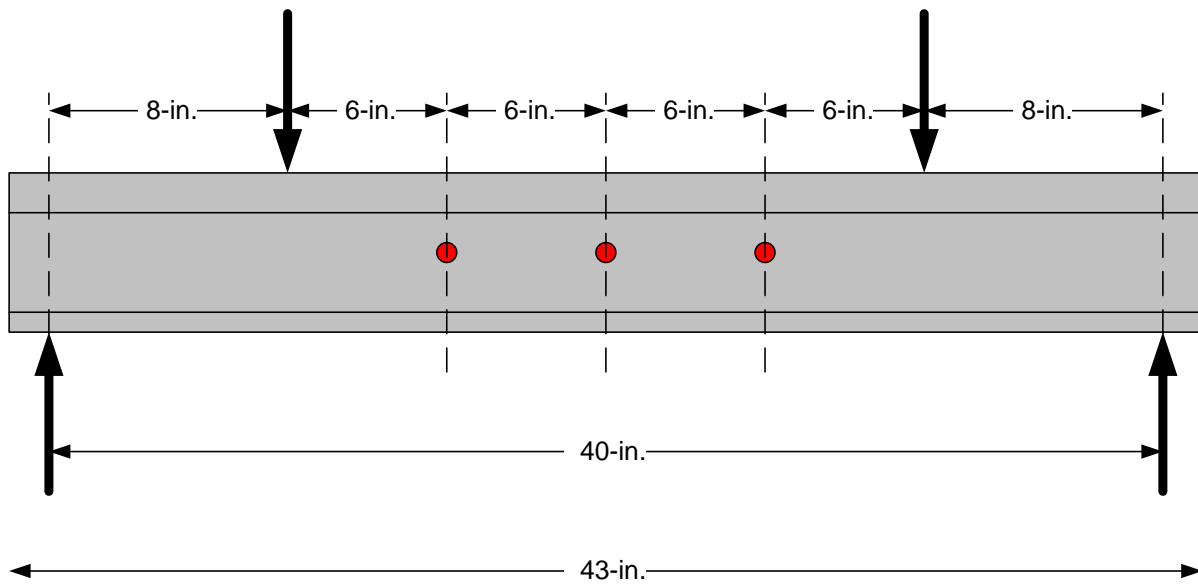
Fatigue Test Layout Showing Specimen Locations and Loading Scheme
